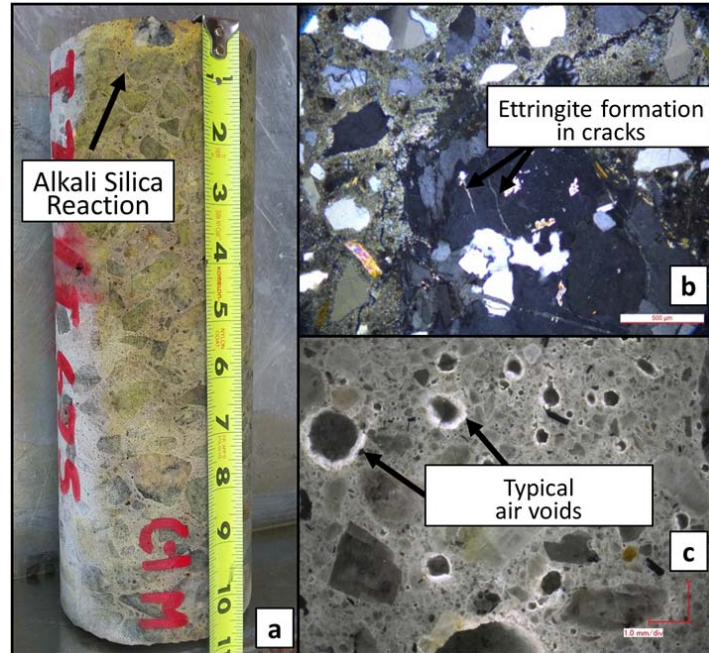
ASR damage found in I-75 section (poor JPCP)
